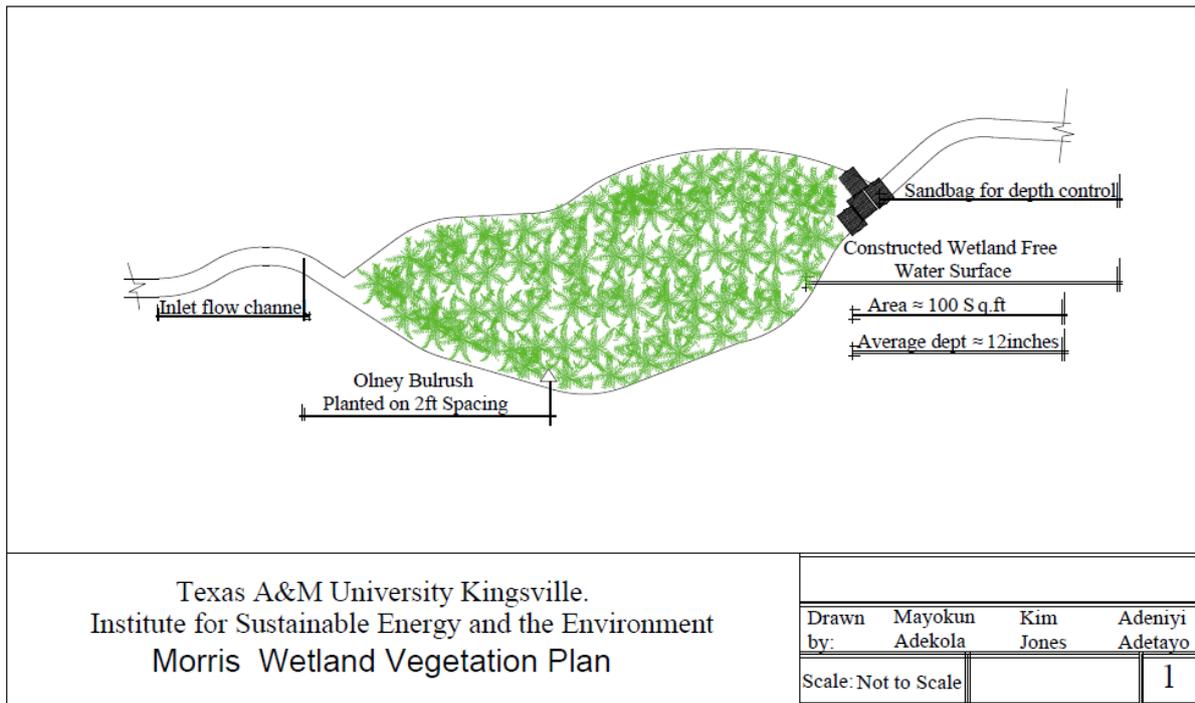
Diagram showing the plan view of Morris RDF constructed wetland.
